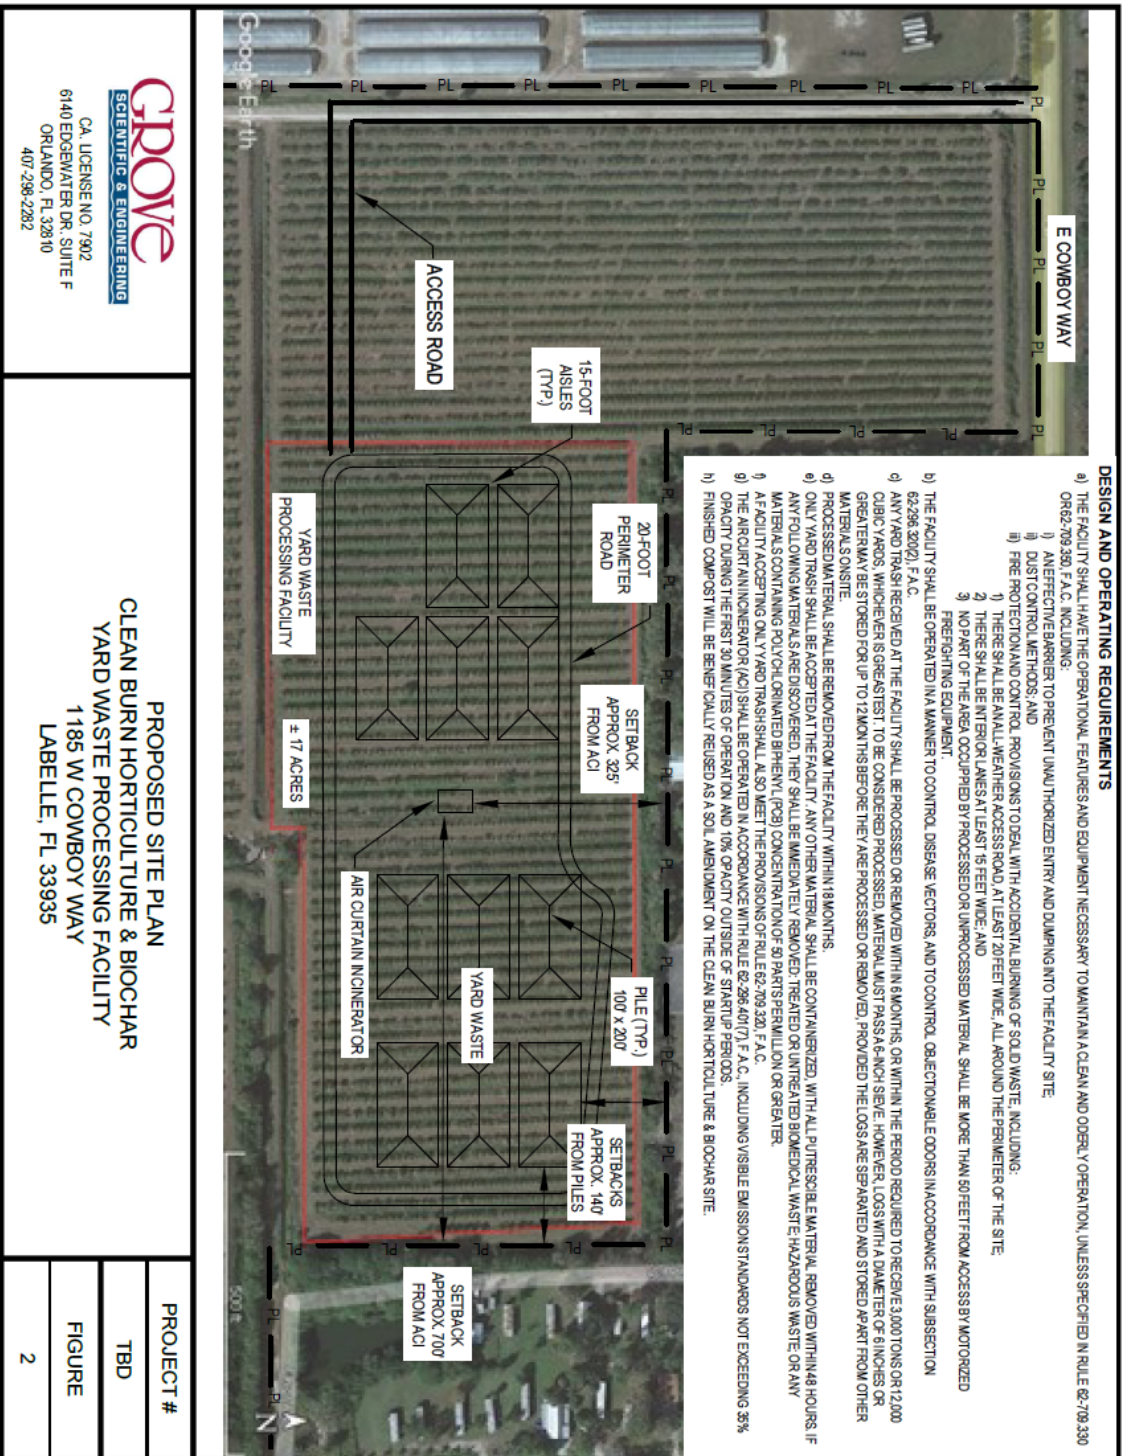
EXHIBIT E - INTERIM HORTICULTURAL RECYCLING SITE PLAN
